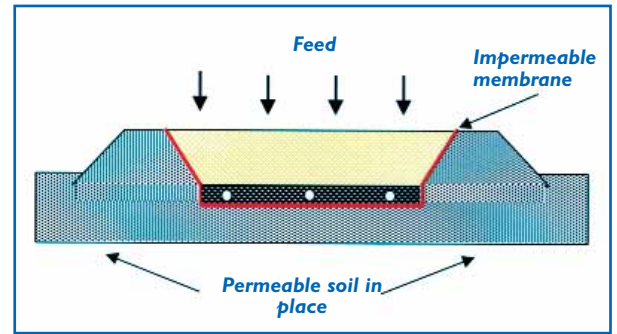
Drained system with a draining bed made leak-proof via an impermeable membrane (Agences de l'Eau, 1993)
